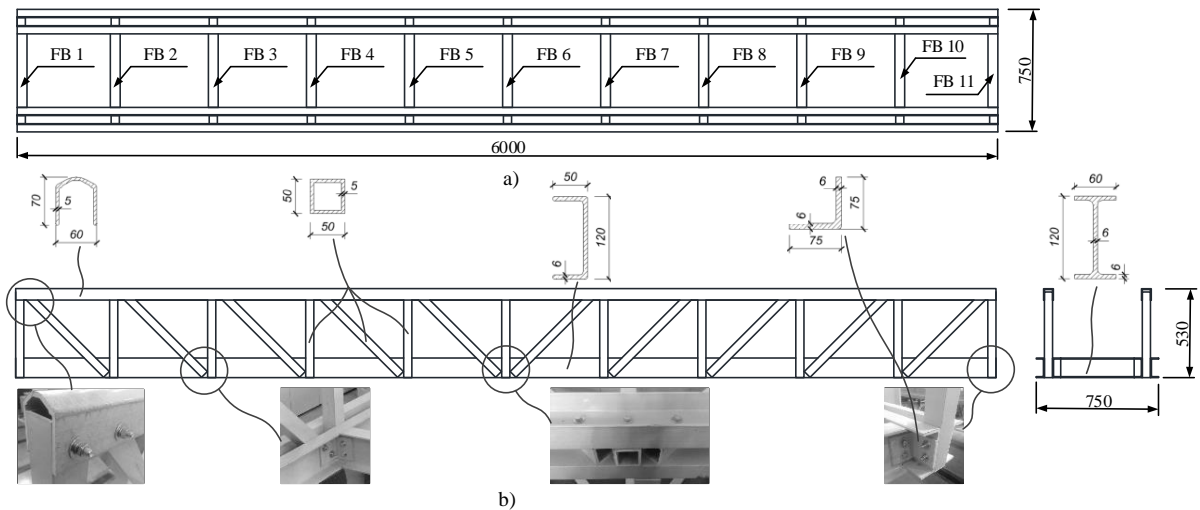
Floor beam (FB) scheme (a) and typical bolt joints between the composite components (b).
